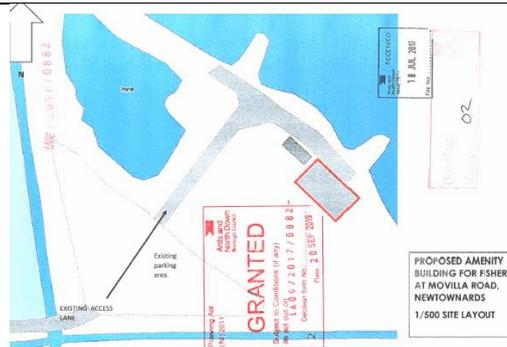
Site location for previously approved building under LA06/2017/0882/O
